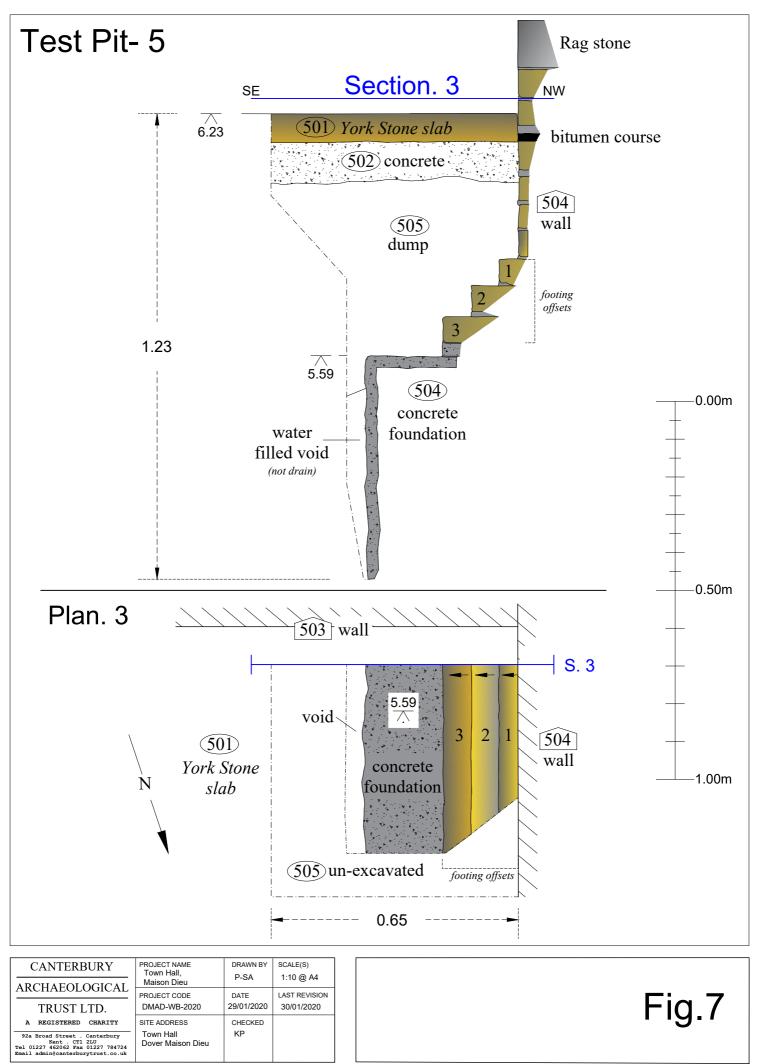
Plan and section through recorded deposits, Test Pit 5
